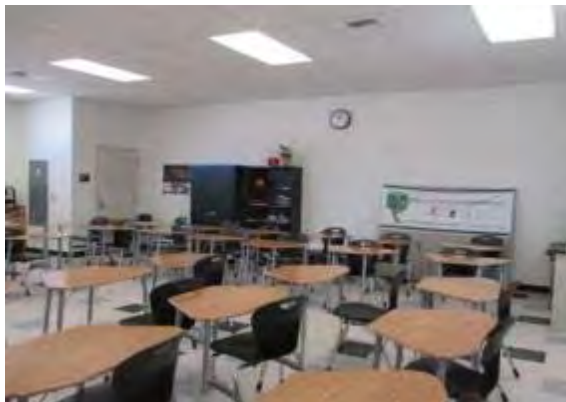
INTERIOR WALL FINISH, GYPSUM BOARD/PLASTER/METAL
